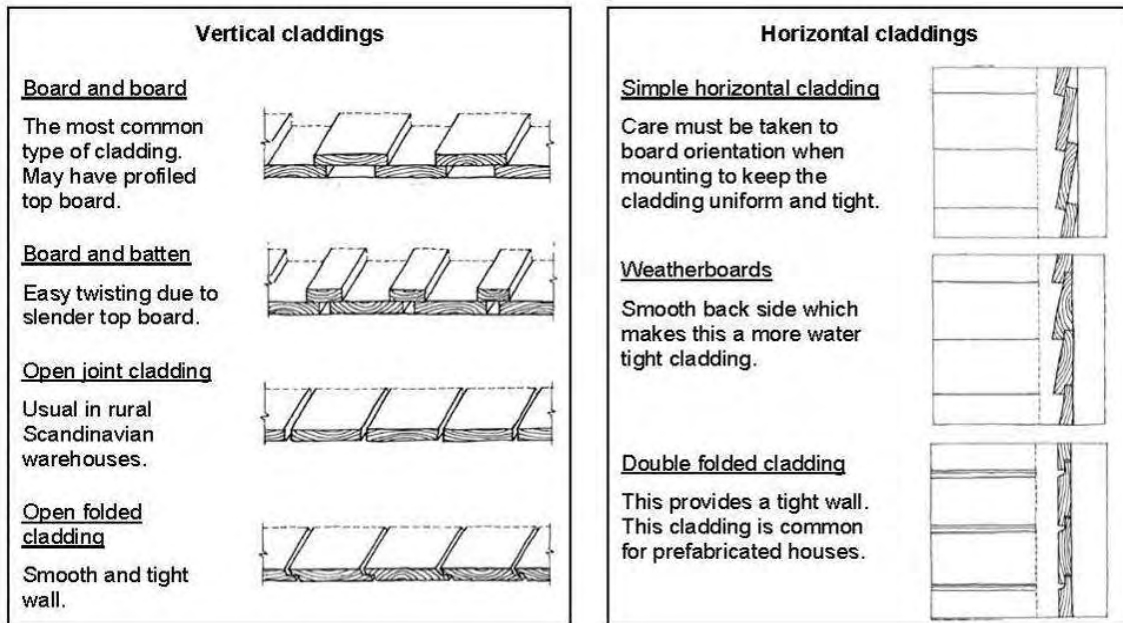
Vertical and horizontal cladding types (FPT 22 2002).
